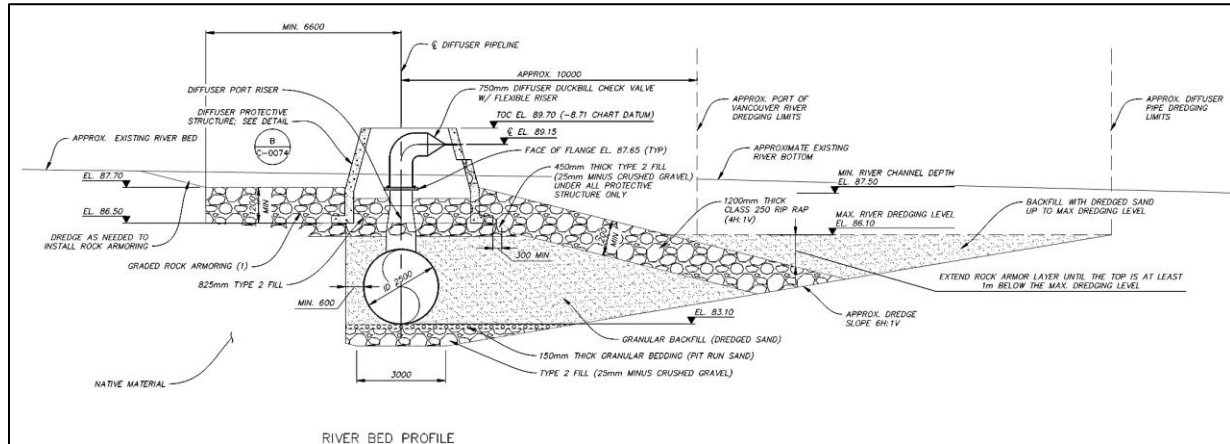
Outfall River Riser Section View (Drawing Number A61C0053)
